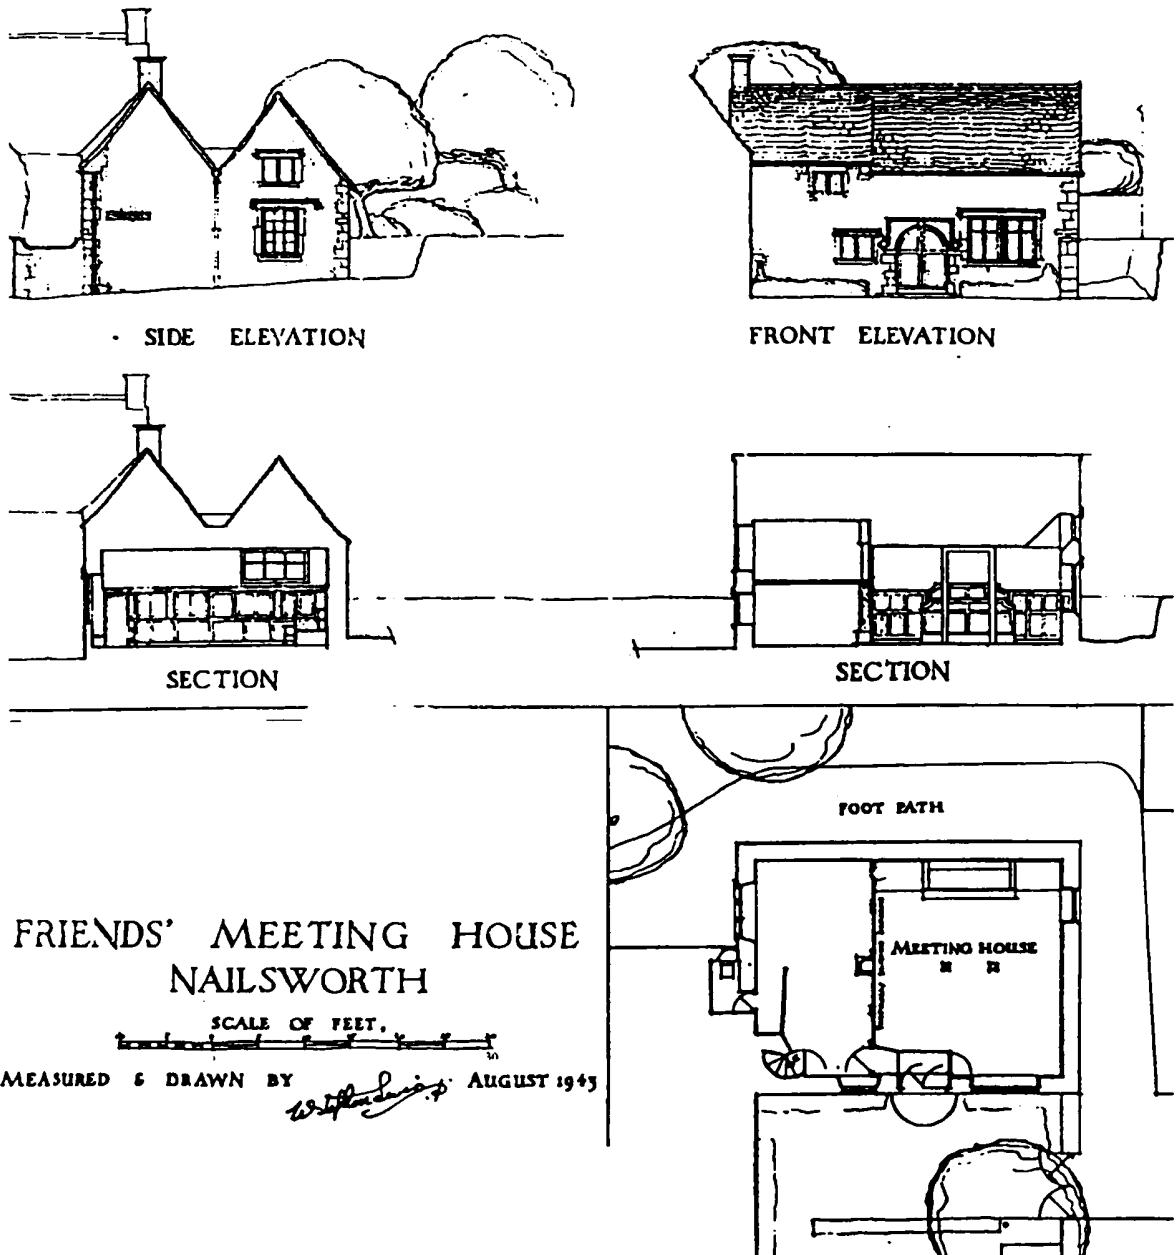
Friends' Meeting House Nailsworth Plan and elevations
